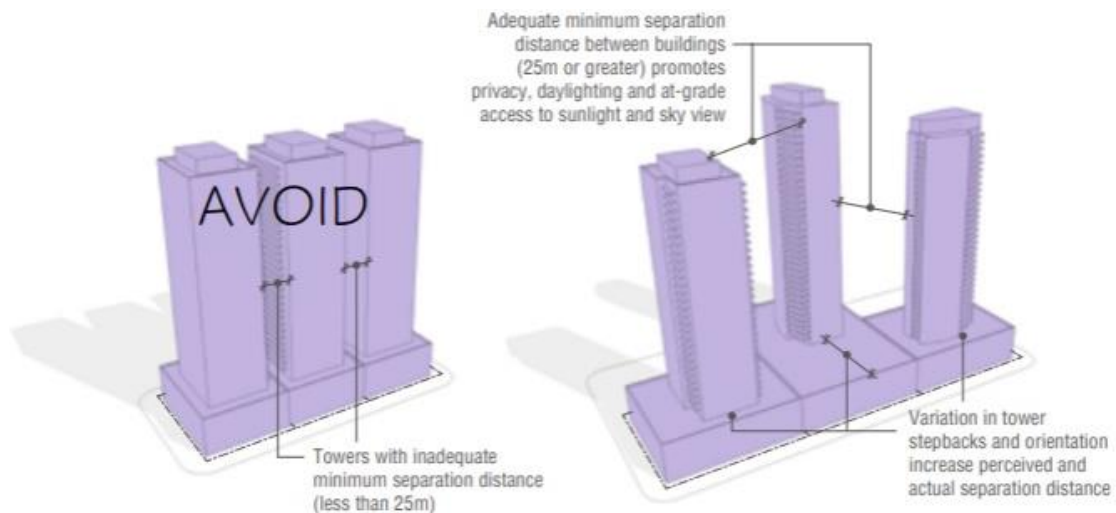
Separation distances between towers (Tall Building Design Guidelines).
